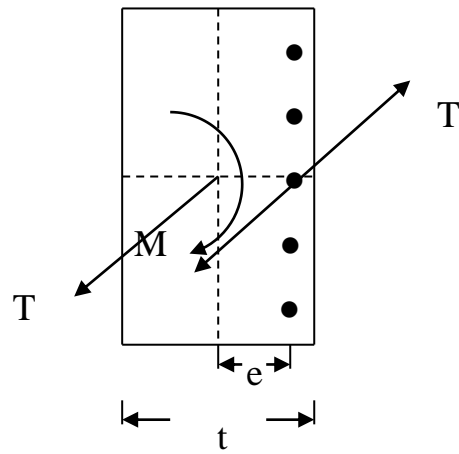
Rectangular tank wall subject to moment and direct tension
